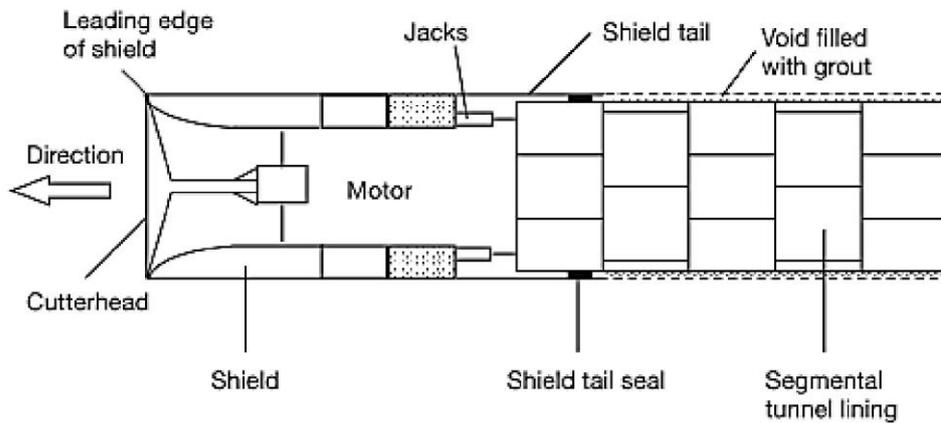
Typical Longitudinal Section of Tunnel Shield (Chapman et al., 2010)
